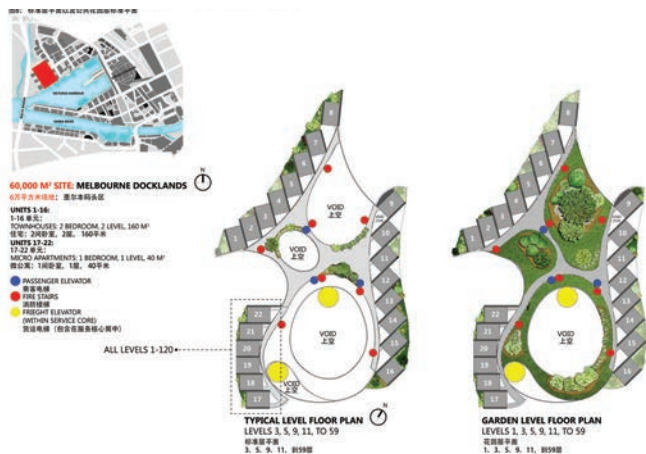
Typical Tower Floor Plan & Typical Tower Communal Garden Level Floor Plan (Source: Ecosystem Architecture)
